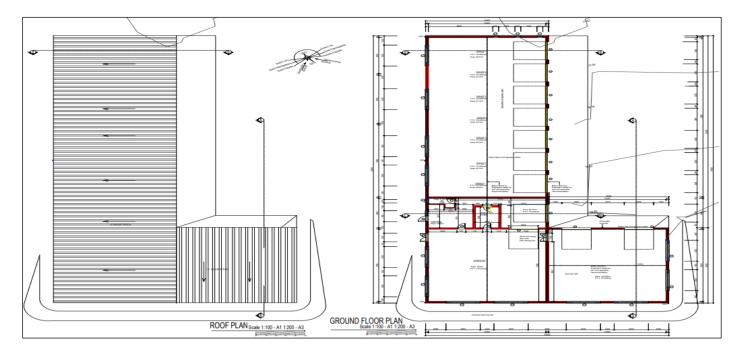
Layout plan for proposed new Garages (TMBA, 2023)
